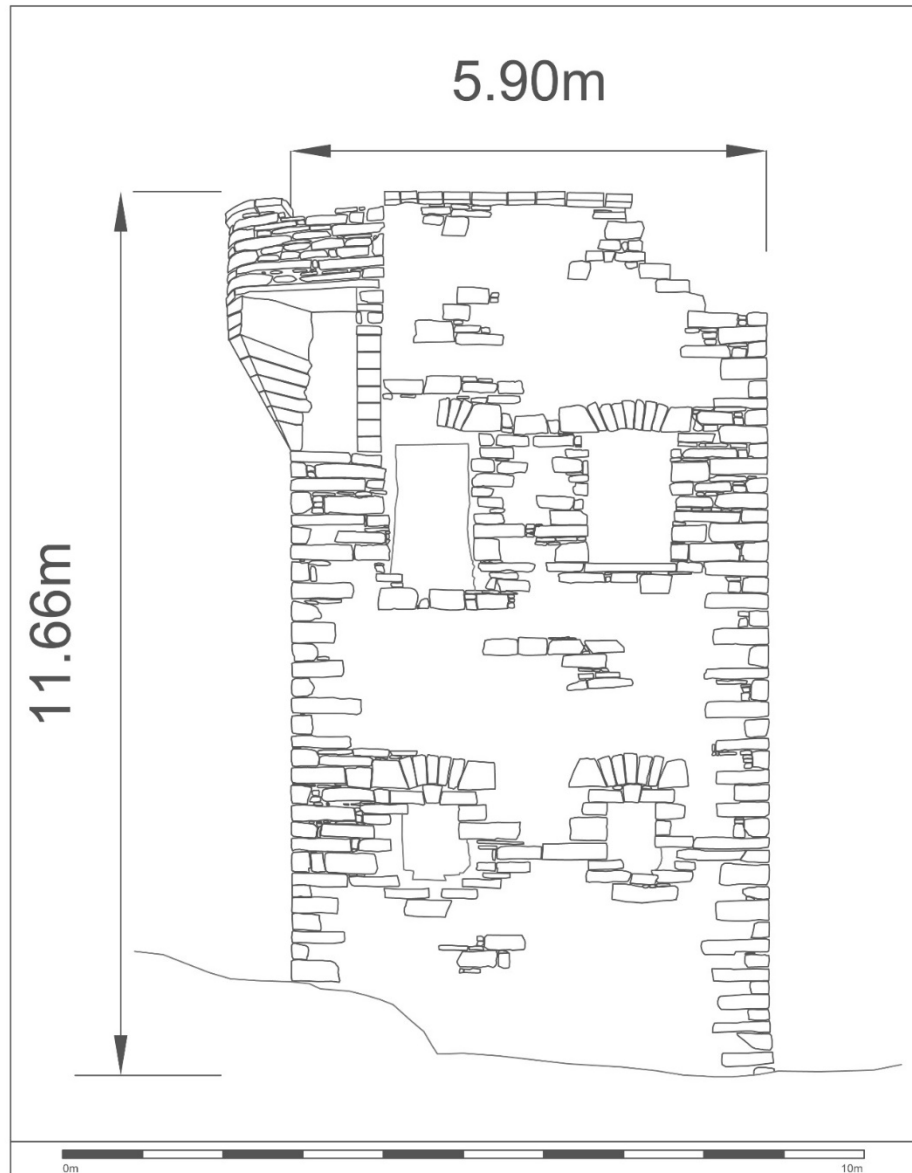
External elevation of the north-west wall of the signal tower at Carrigan Head Signal Station.
